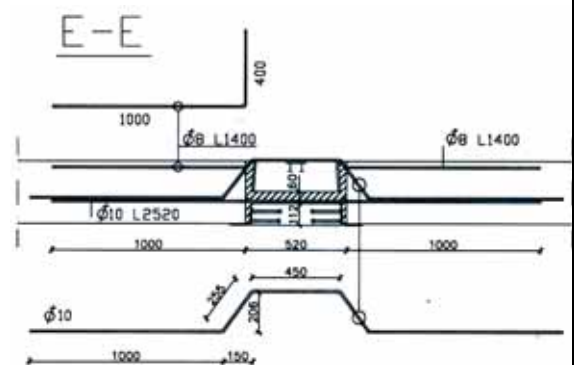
Section along outer edge of floor specimen, see Fig. 2. The rebars are made of A500 HW.
